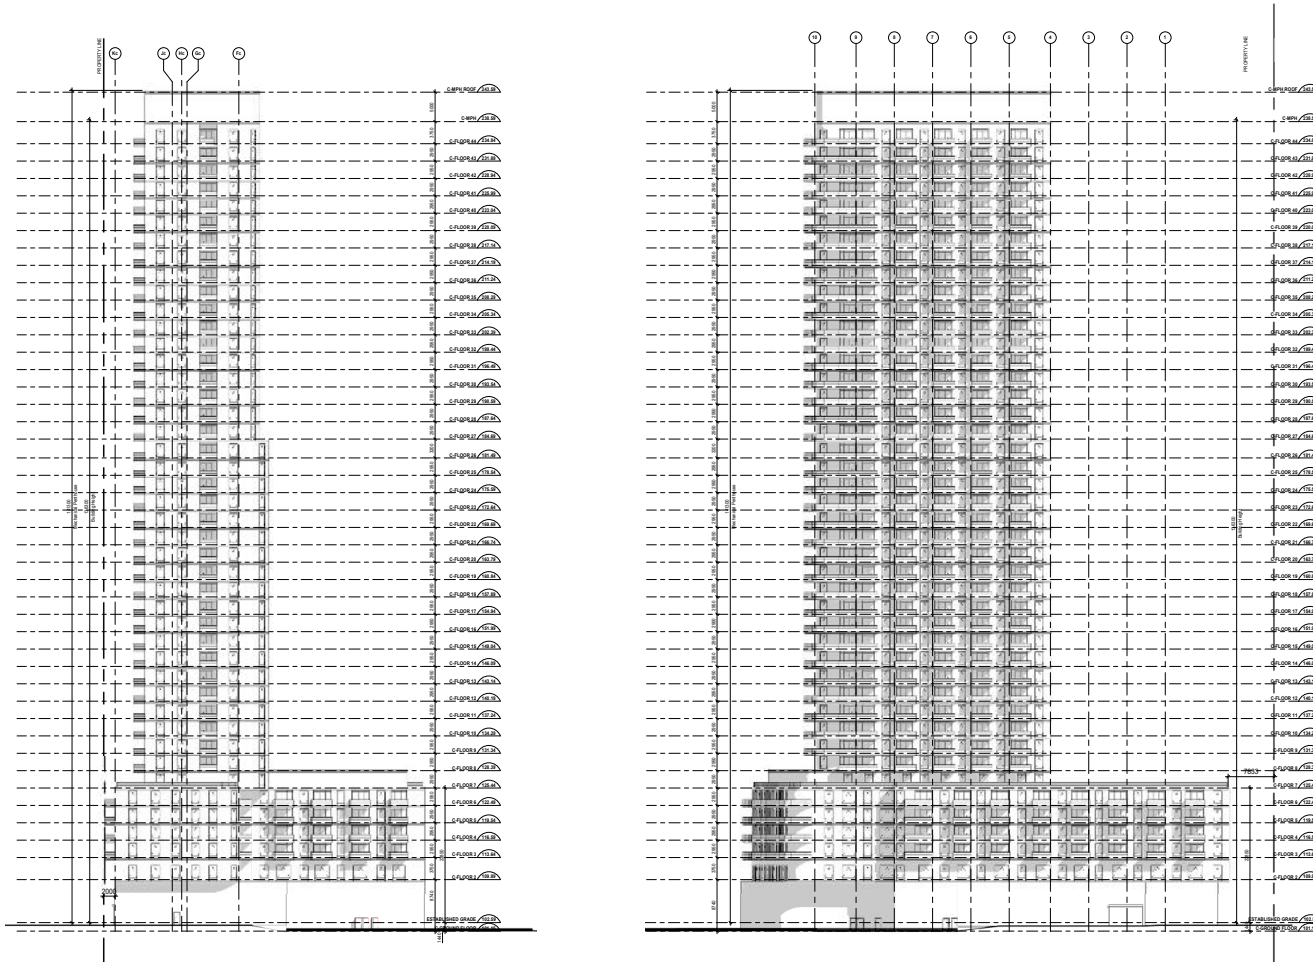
South and West Elevations - Building 1 (Provided by BDP Quadrangle)
